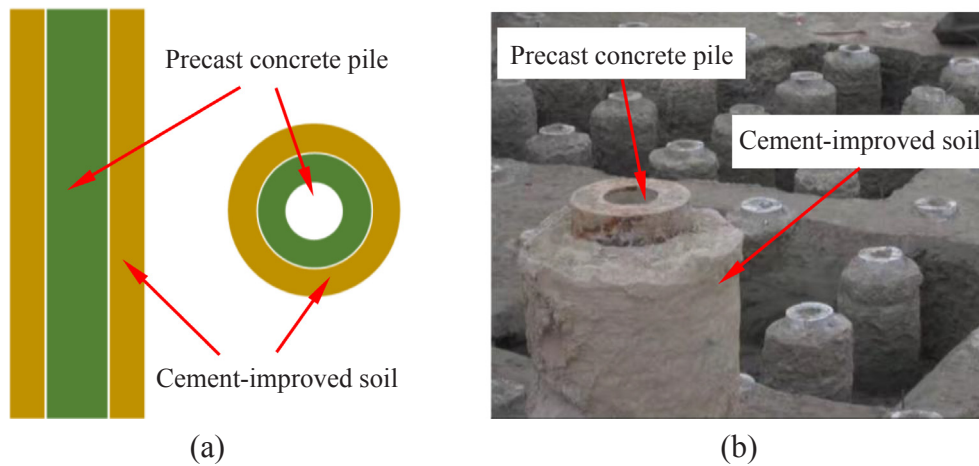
(a) Schematic diagram of pile with cement-improved soil reinforcement; (b) photo of field excavation.
